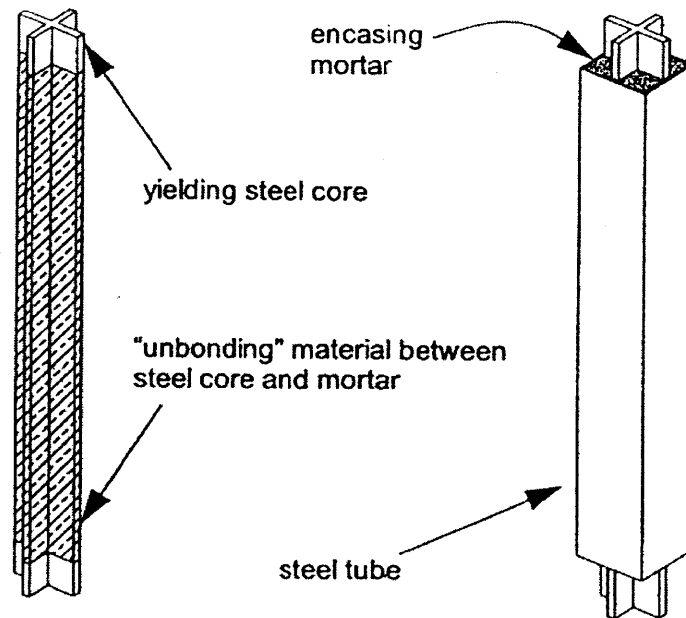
Hysteretic Damper (Unbonded Brace) [9]
